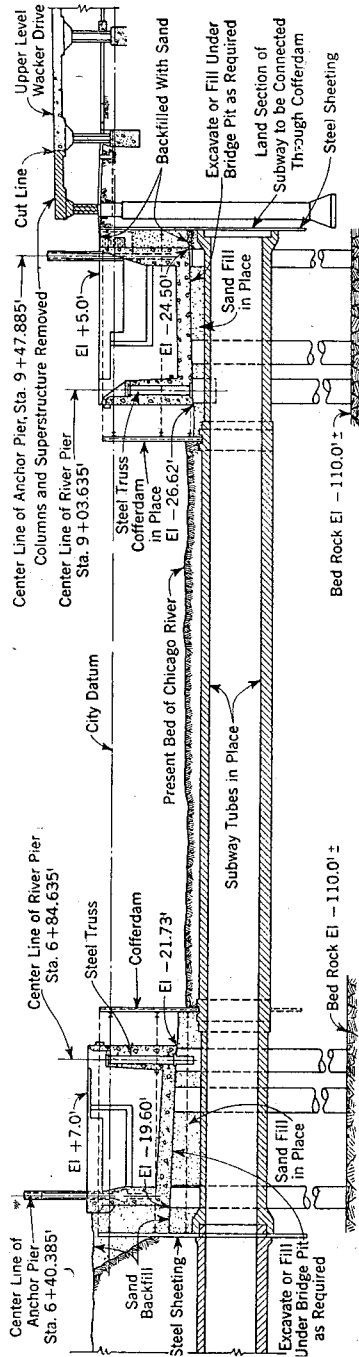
COFFERDAM FOR A PIER OF NORTH STATE STREET BRIDGE, CHICAGO.
